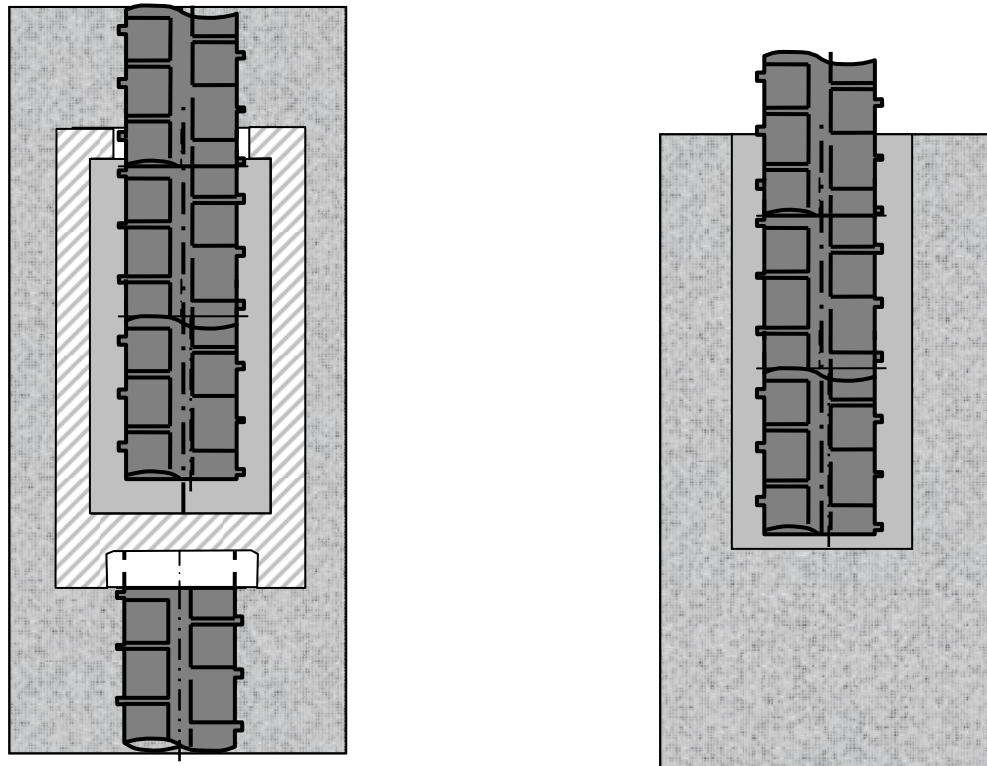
Epoxy-bonded rebar-coupler, on left, and adhesive bonded anchorage to concrete, on right.
